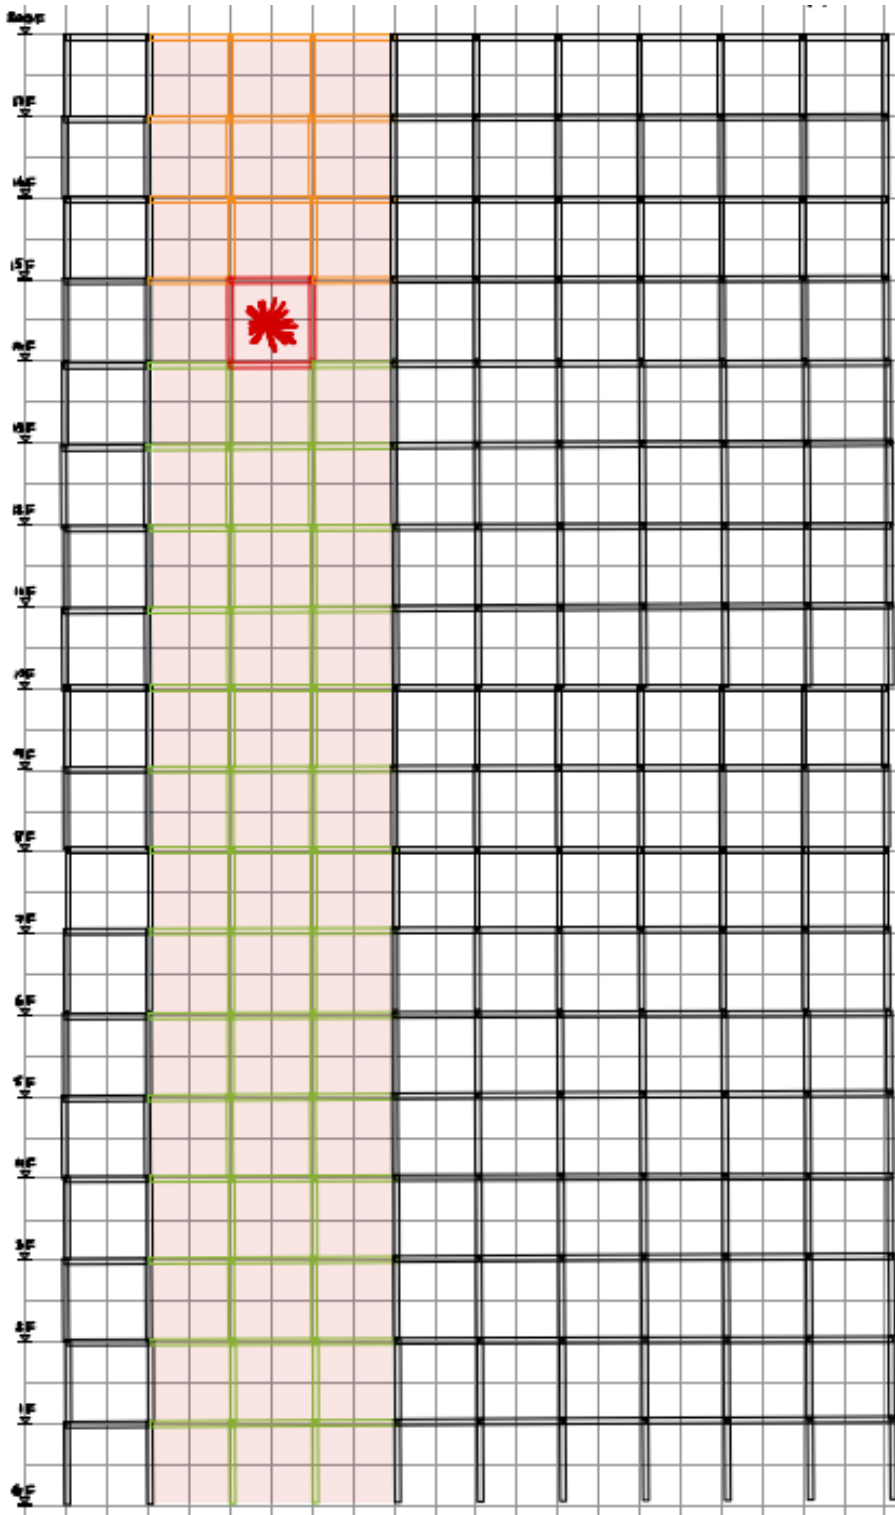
Collapse mechanism if explosion event occurs in the upper 8 floors (elevation)
